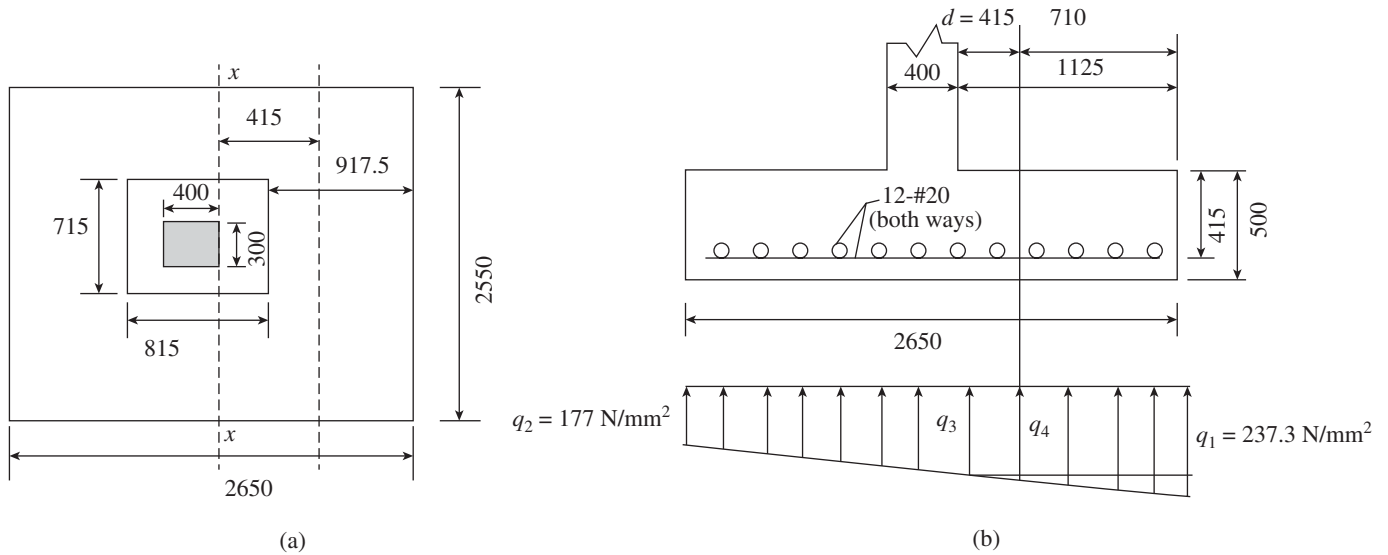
Rectangular footing with axial force and moment for Example 15.5 (a) Plan (b) Section
